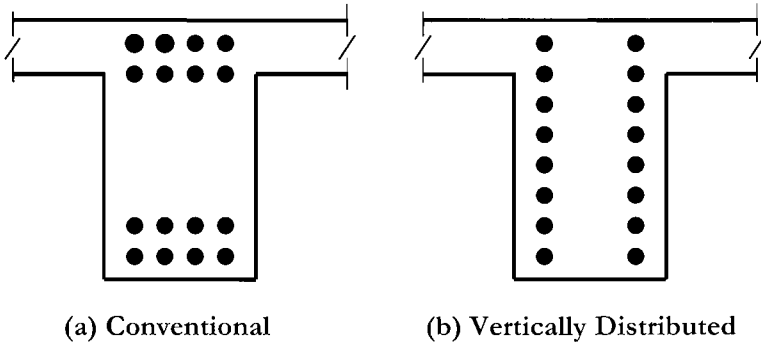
Alternative Distributions of Beam Flexural Reinforcement for Reinforced Concrete Frames^[W1]
